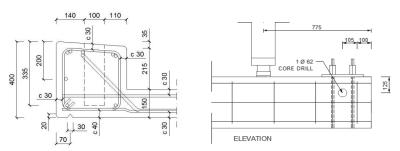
(a) Cross-section of the edge beams (b) details of the test set-up and the strengthening bars.
